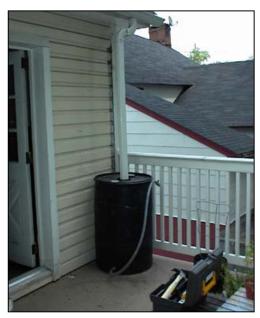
Rain Barrel Used on a Back, Second Floor Balcony
